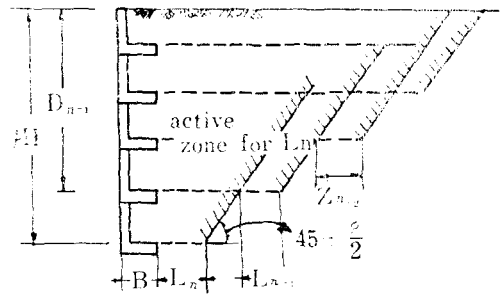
Required anchor length of fabric filter for L-typed concrete block wall.
